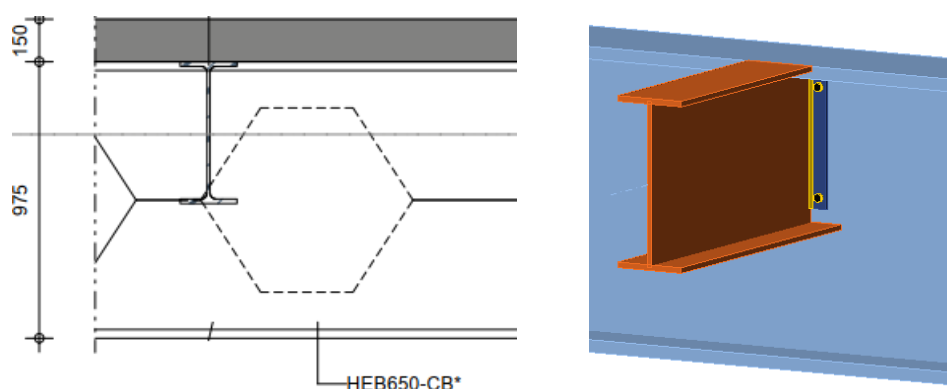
Connection between the floor beam (IPE 450) and the secondary beam (HEB 650-CB) Left: design made by Royal HaskoningDHV, right: design made for this research, to be able to compare this design to the alternatives. This connection is not verified whether the end plate, bolts, and welds are strong enough. This drawing is only meant to provide insight in what the connection could look like in a regular design.
